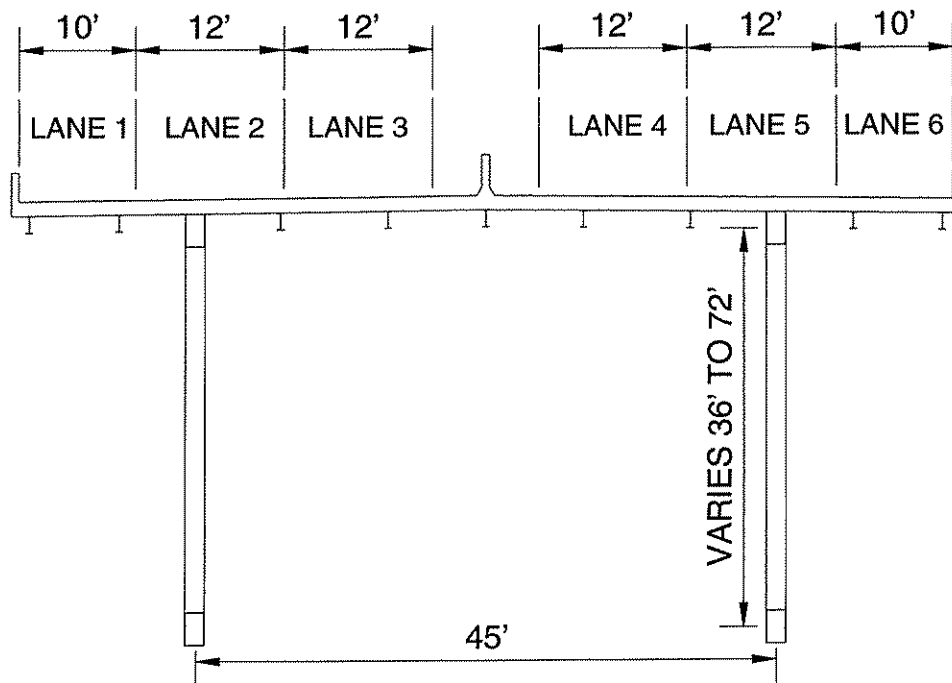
Cross-section drawing of the SR33 Lehigh River Bridge looking north.
